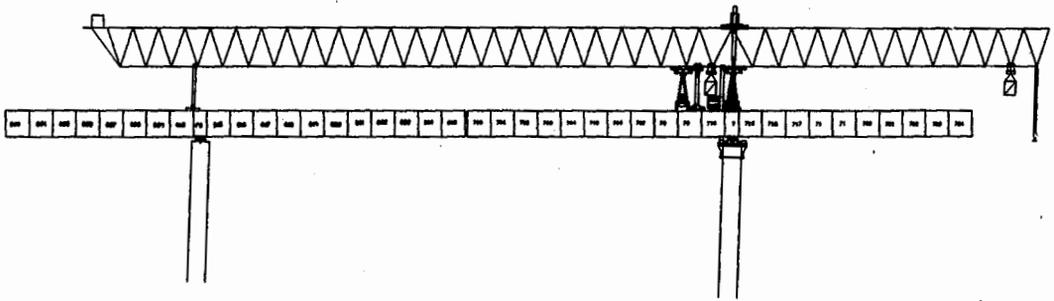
Pier head erection on the new Baldwin Bridge.
